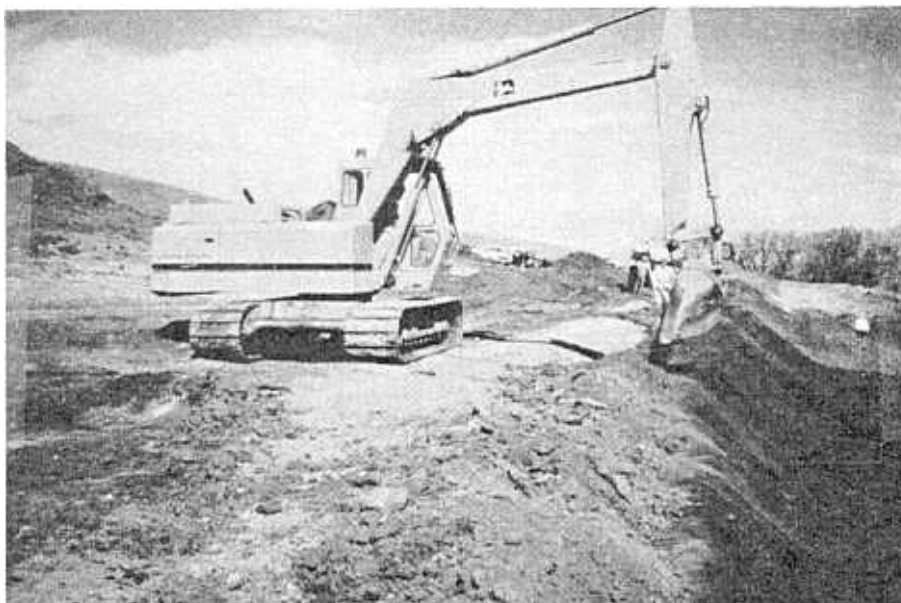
View looking upstream showing the filling of the side anchor trenches.
